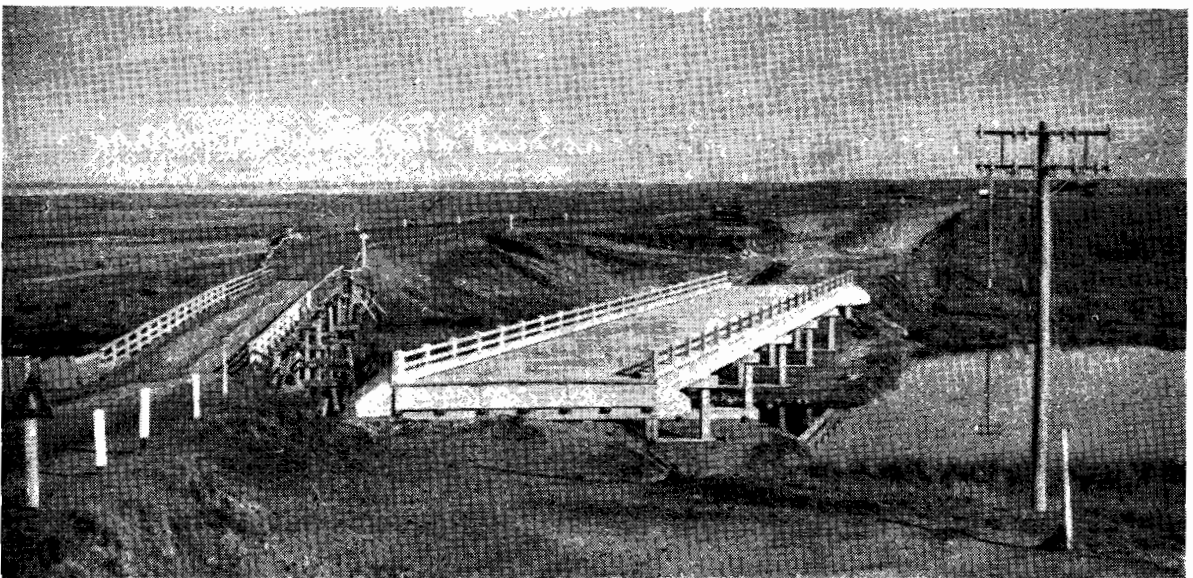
New concrete bridge on Princes Highway West over Surry River at Narrawong.
